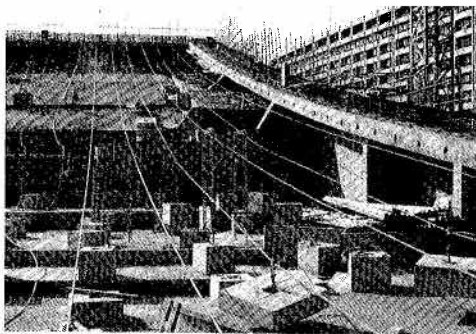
(a) 1t concrete blocks hung from cable cross-clamps
